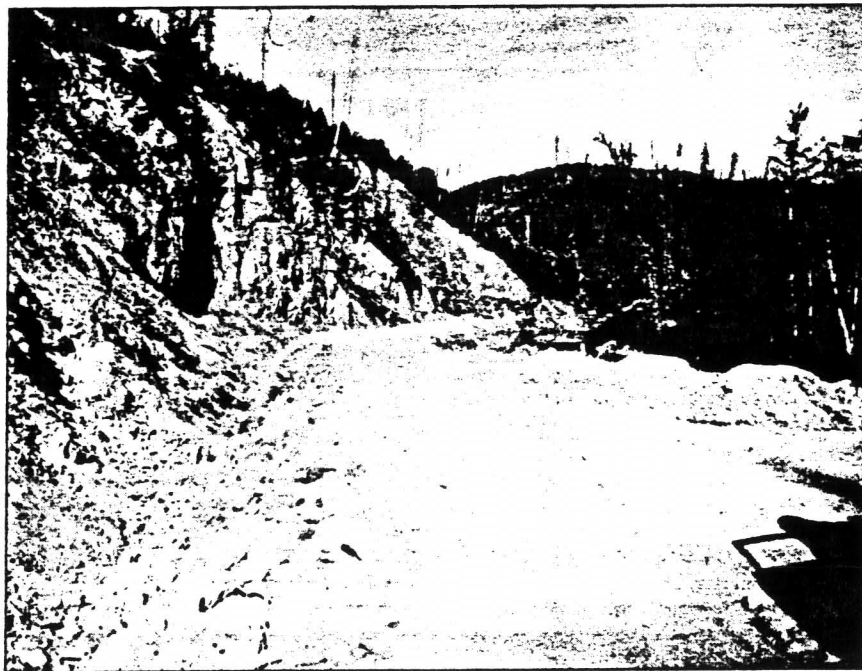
Road constructed to Toutle Hatchery water supply intake. Green River on right. Pipeline buried between bank and road. Length of pipeline and road approximately one mile. September 1950.
